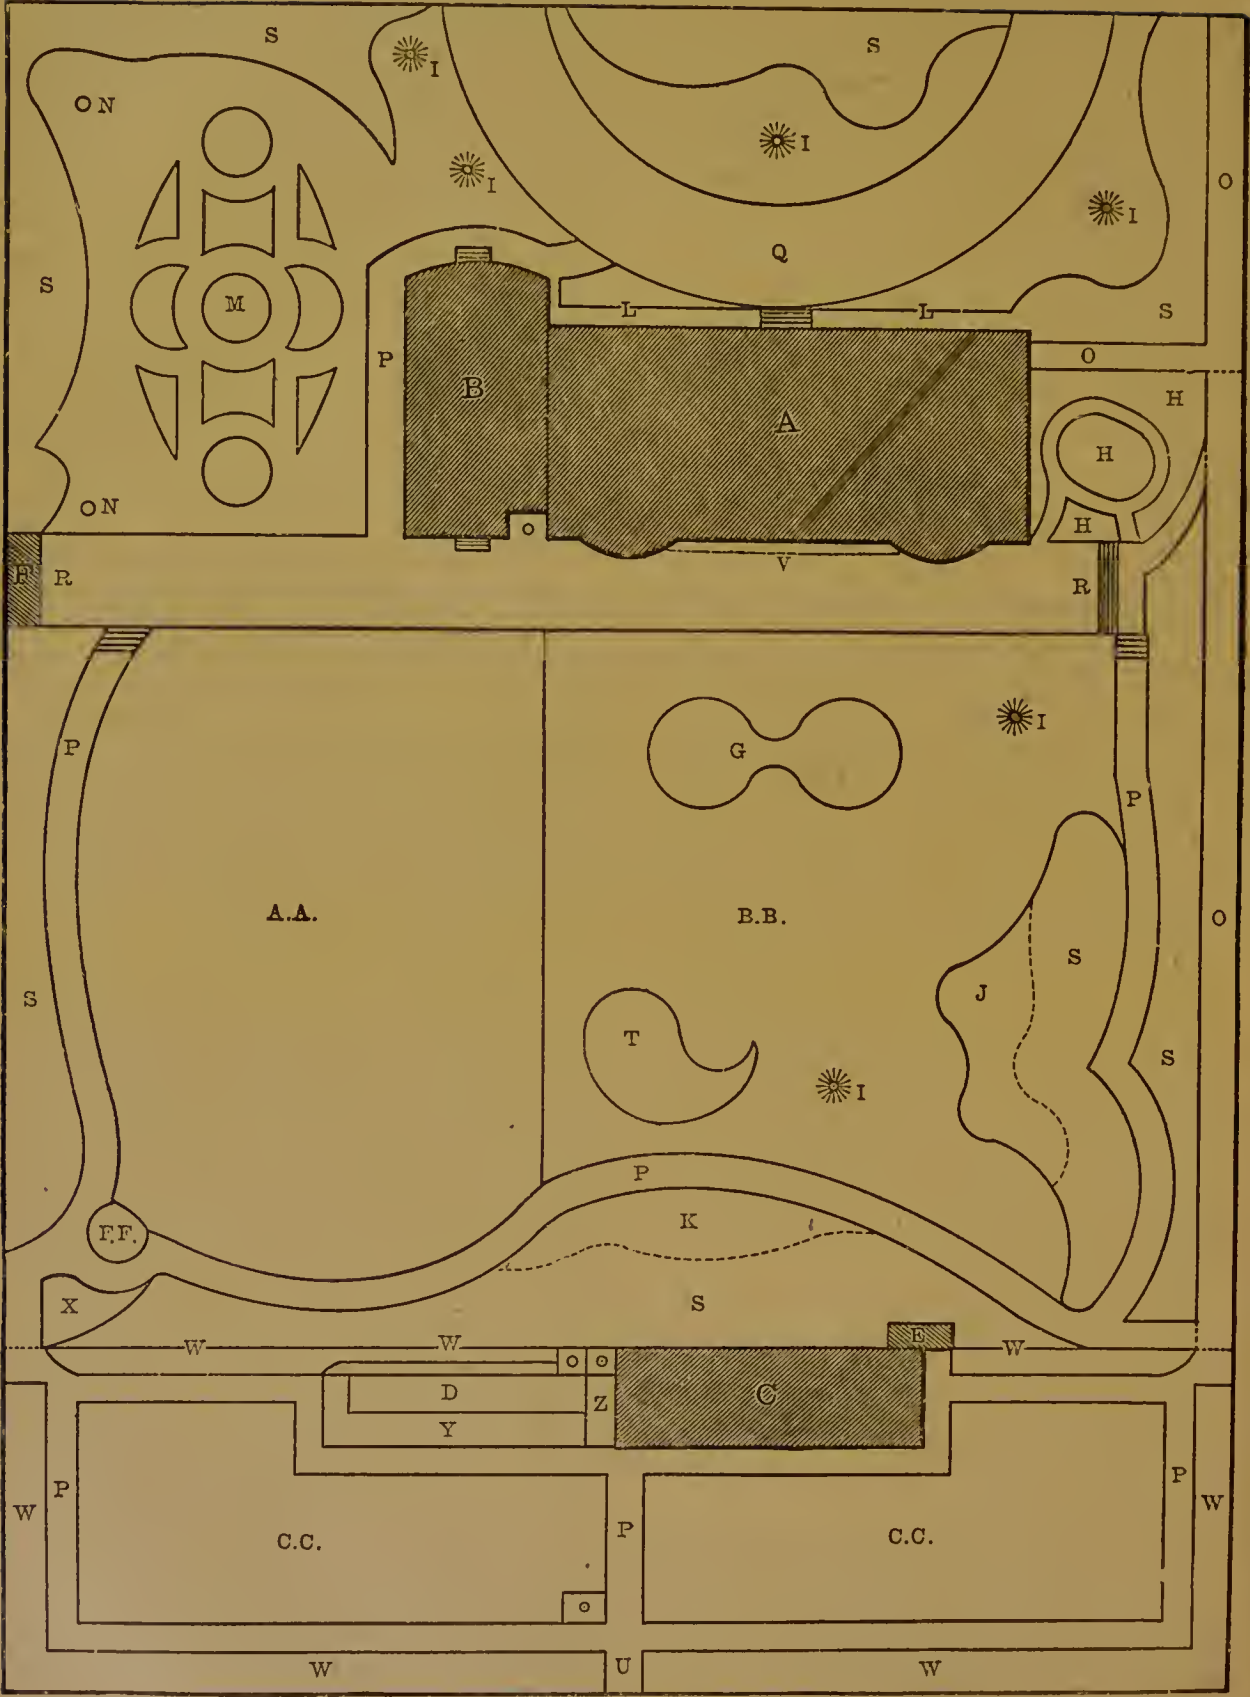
PLAN FOR ONE ACRE OF GROUND.
